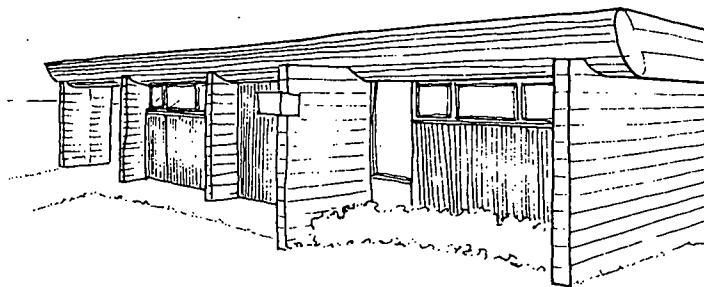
Harold Hay's Solarchitecture House: Roof Pond
